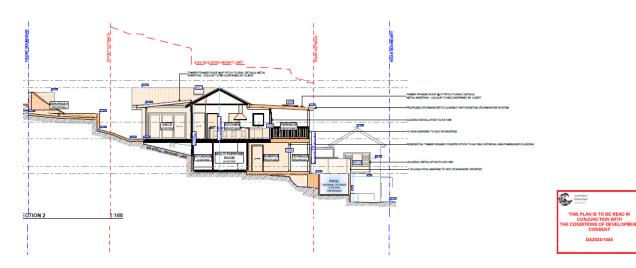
Extract from Approved Cross Sections – Cross Section 2 (DA10)
